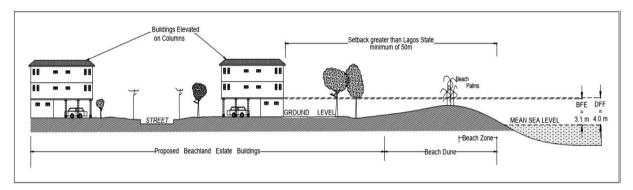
A sketch of reduced exposure of buildings in the Lekki Peninsula to storm surge flooding through elevation of building/living quarters above the suggested BFE.
